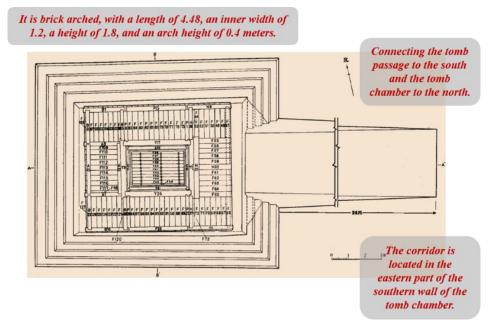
Floor Plan of Tomb No. 41 in Baizhuang, Jiaozuo
